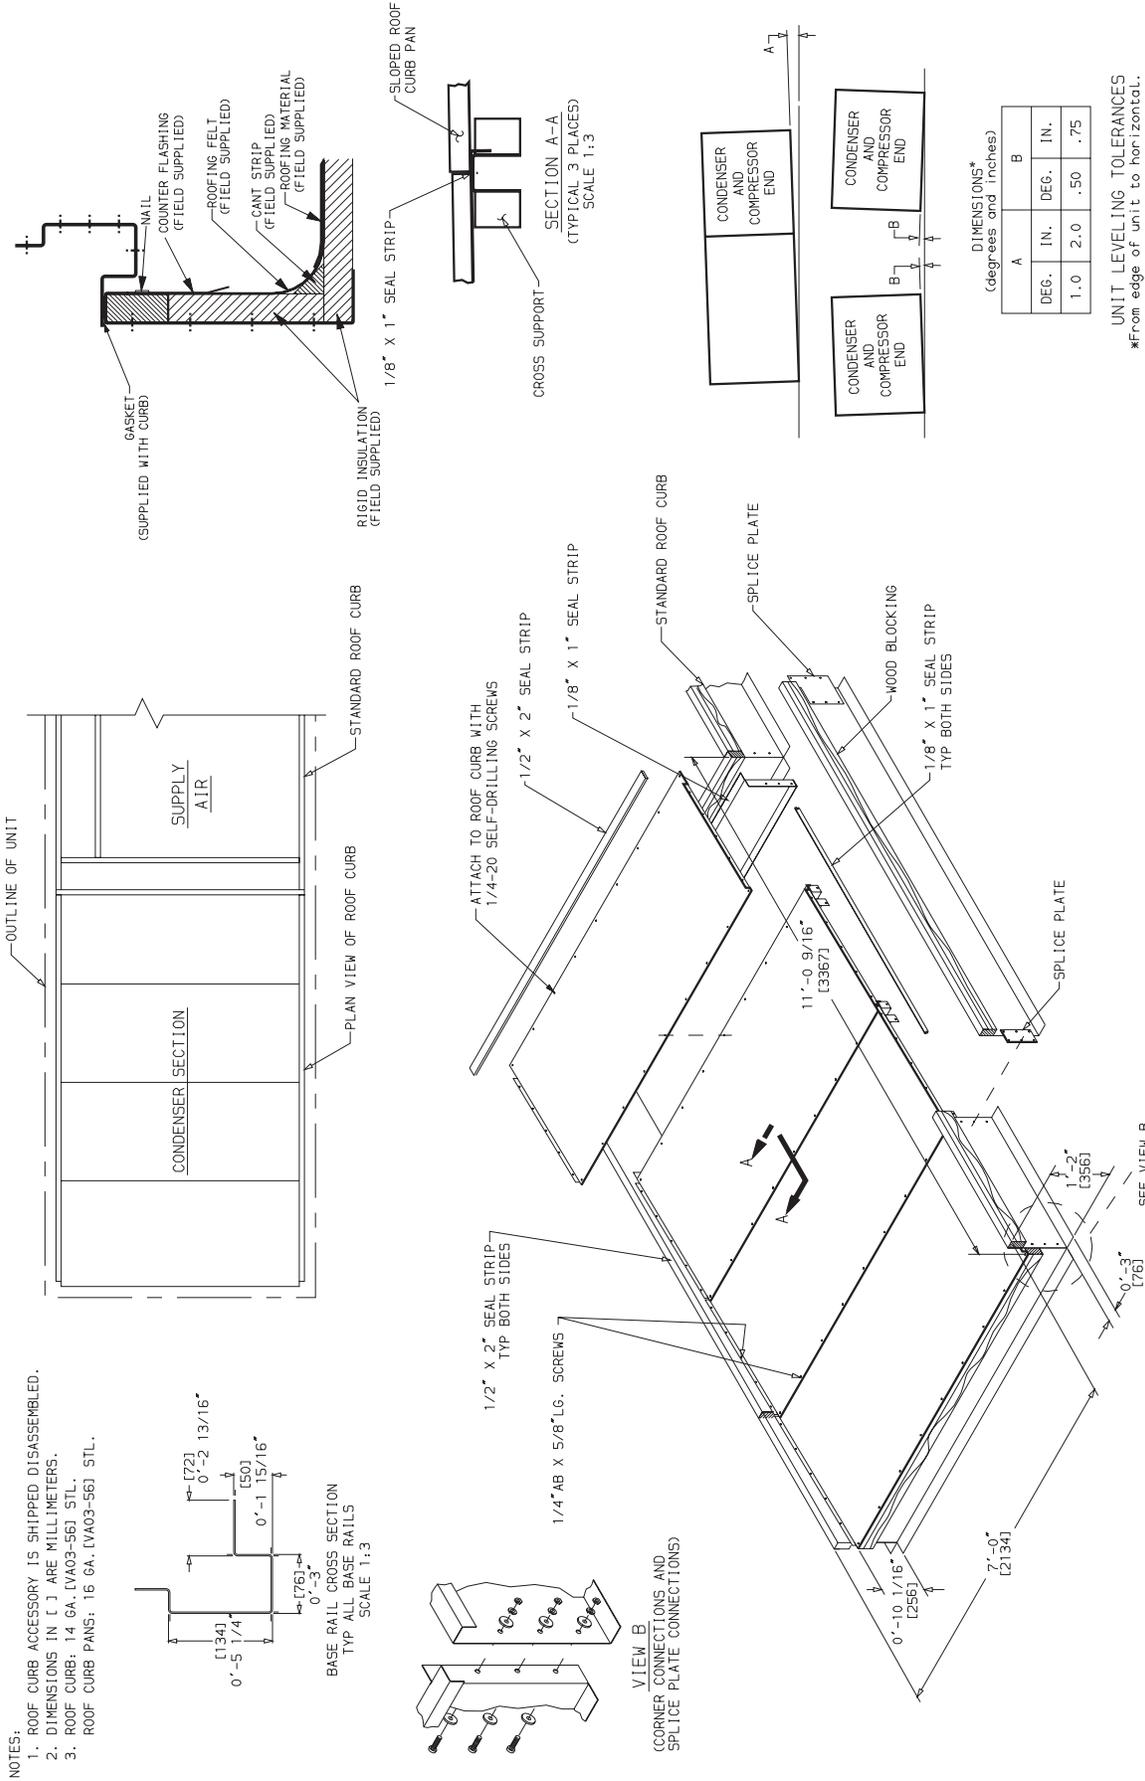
Condenser Section Roof Curb (Size 070-105 Only)
